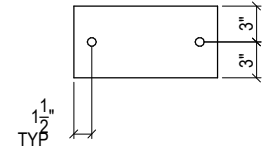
Bearing plate anchorage per keynote 8, contractor may substitute the anchor bolts with headed studs. See attached detail.
